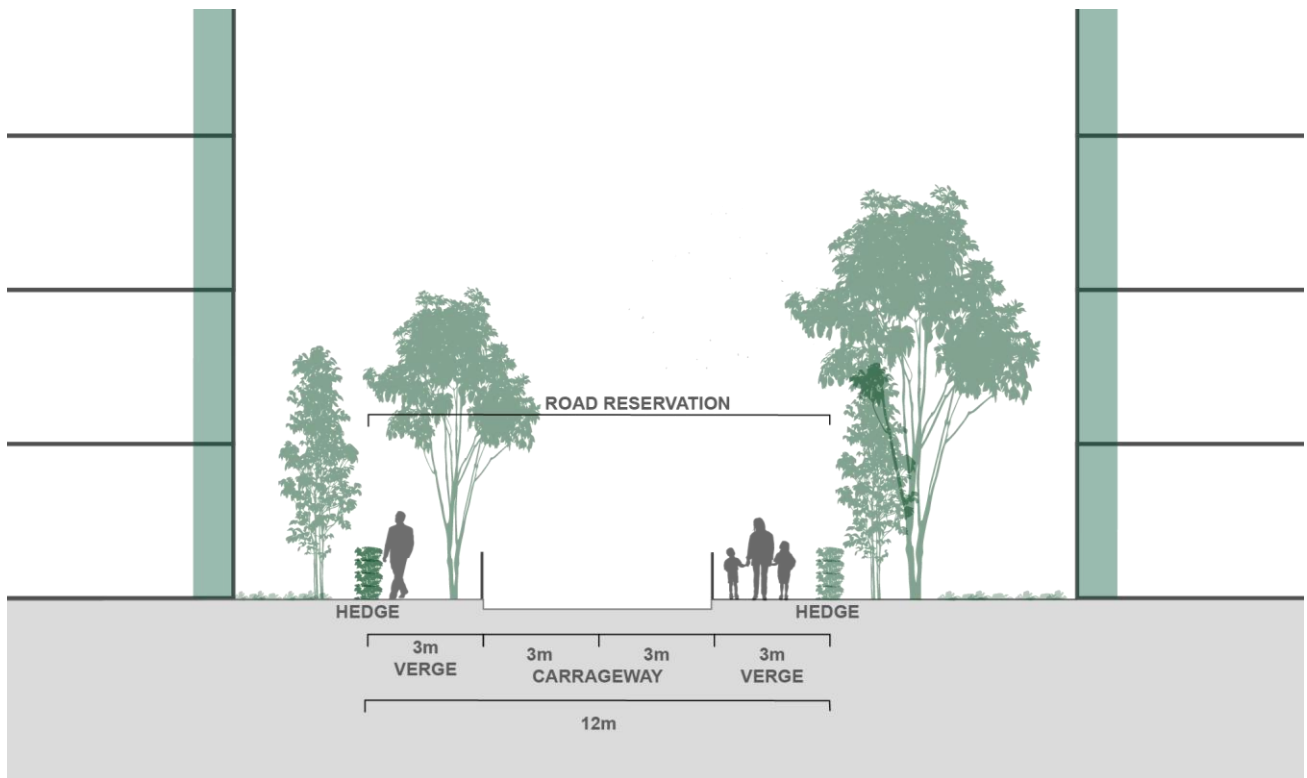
(a) Section - New Connecting Road – (Berry – Park Road)
